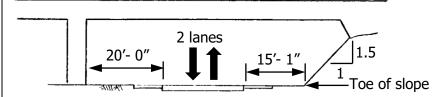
Bridge elevation view of horizontal clearances for a 2-lane highway feature with 2-way traffic below the bridge.
